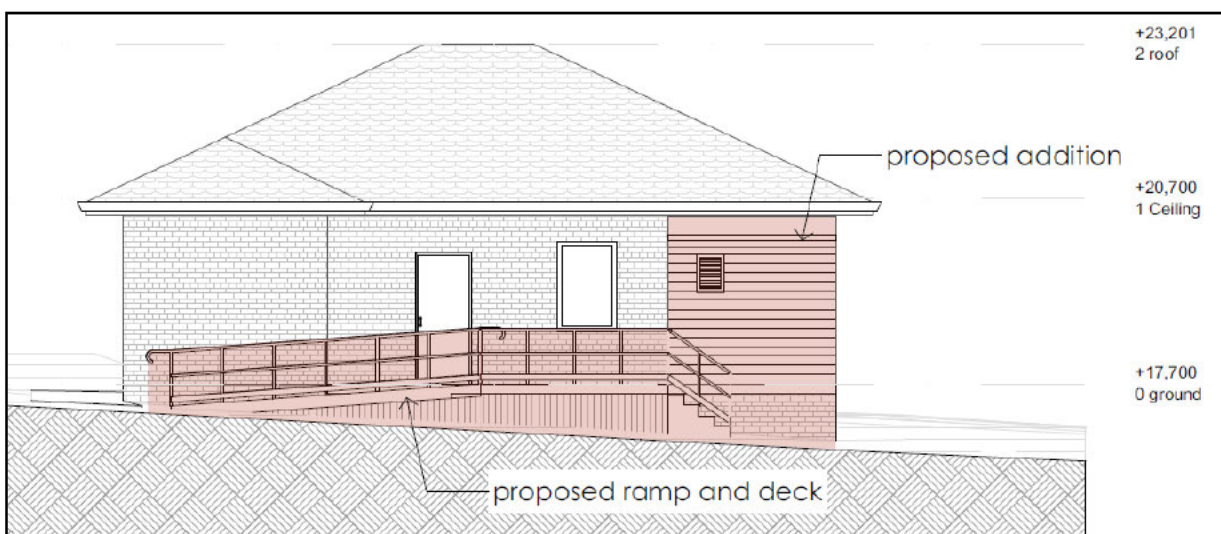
Proposed Elevation (North-West / rear) submitted with DA0298/23 (not to scale)
